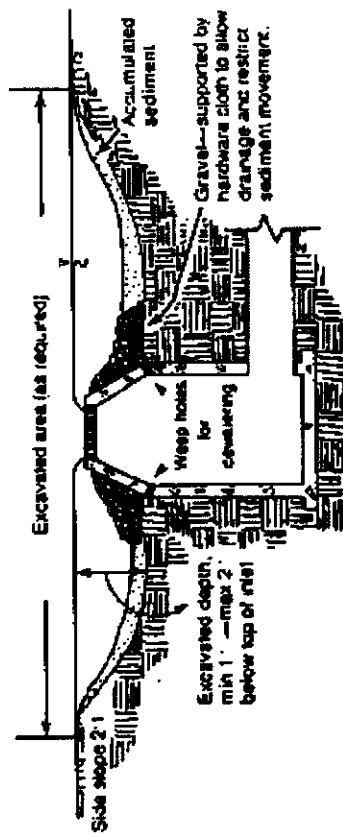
Excavated Drop Inlet Protection (Temporary)
